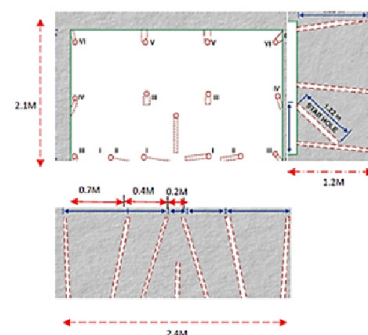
Drilling pattern and blast hole geometry (Wedge cut).
